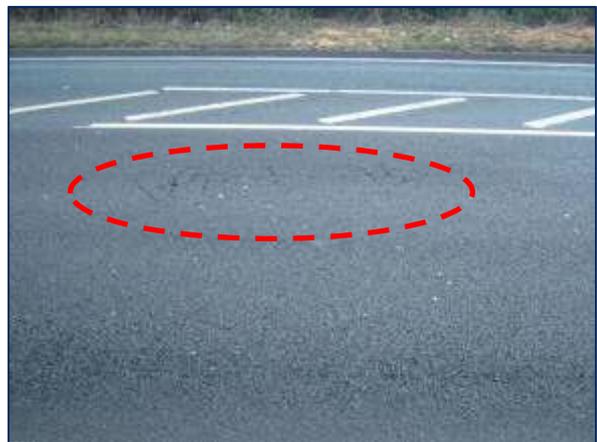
T cracks (NB lane) 2229 (Section 1900A5/157, ch. 25 m)
